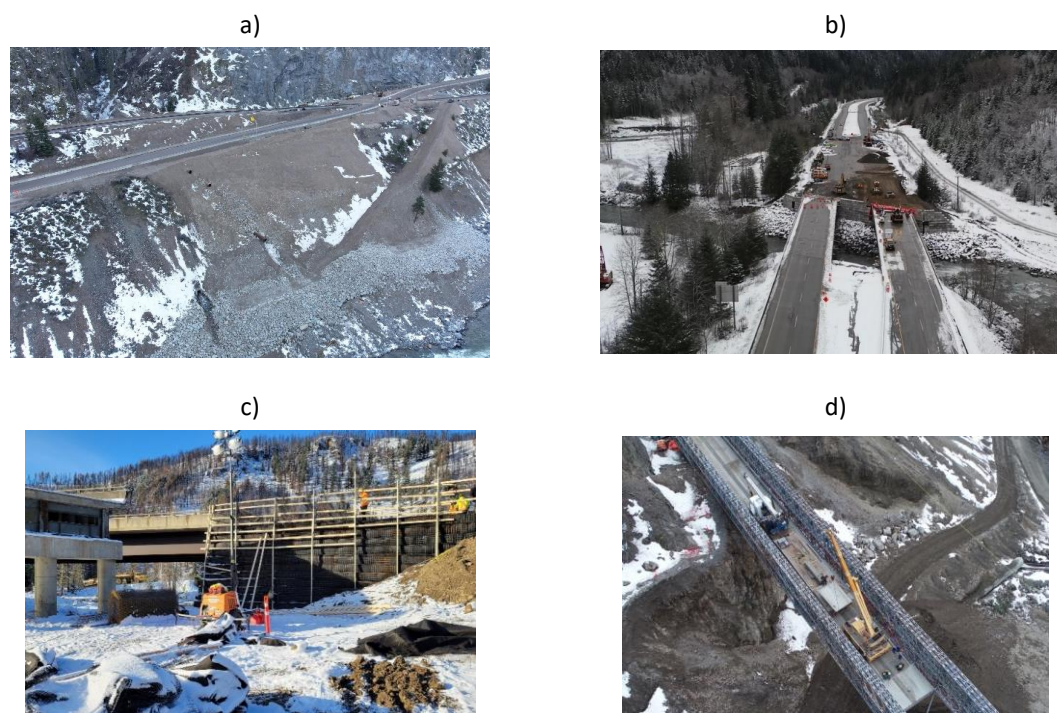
Quick restoration activities. a) Tank Hill underpass (January 14, 2022); b) Jessica bridge on Highway 5 (December 13 2021); c) a new bridge at Bottletop Bridge site on Highway 5 (December 5, 2021); d) a double-triple temporary bridge at Falls Creek (January 19 2022); ©BCMoTI.
